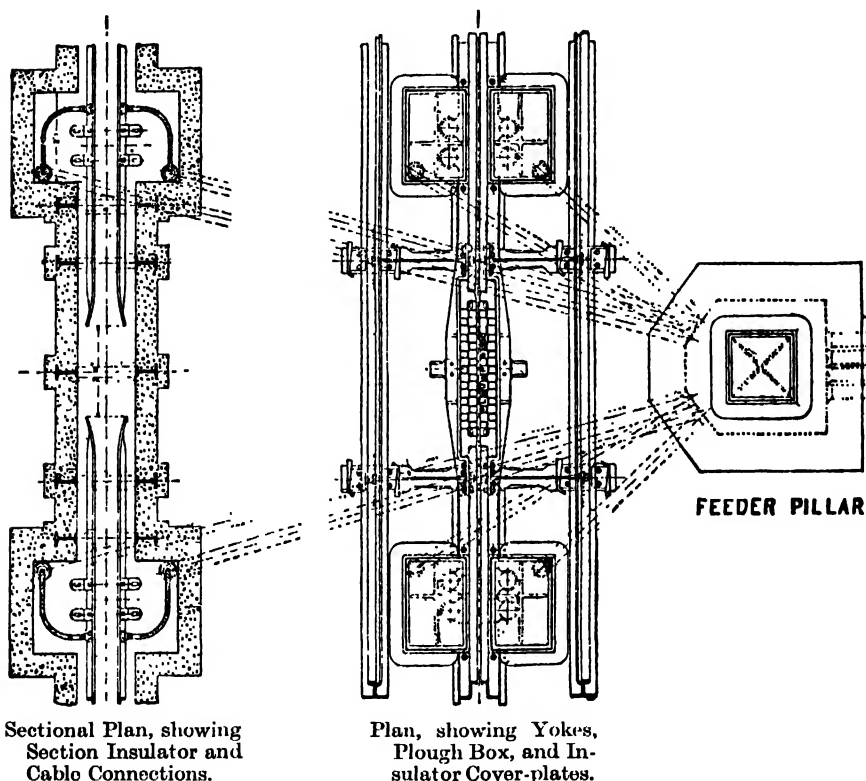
Section Insulator and Plough Box (L.C.C. Tramways). NOTE—The cable ducts from conduits to feeder pillar are shown in dotted lines.
